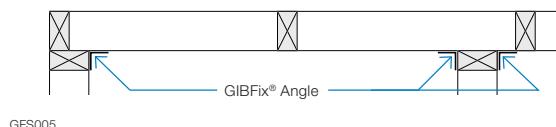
GIBFIX® FRAMING SYSTEM (ALTERNATIVE LAYOUT)
